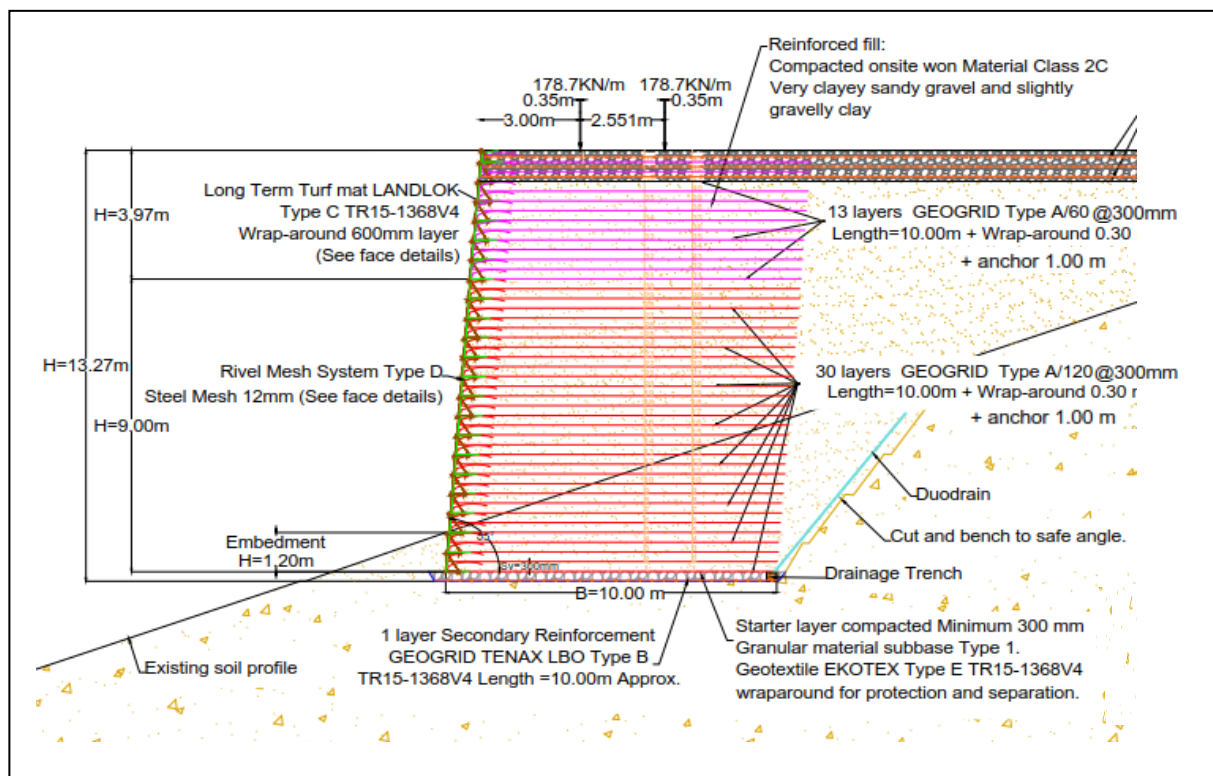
Cross-Section Reinforced Soil Wall Max H = 13.3m
